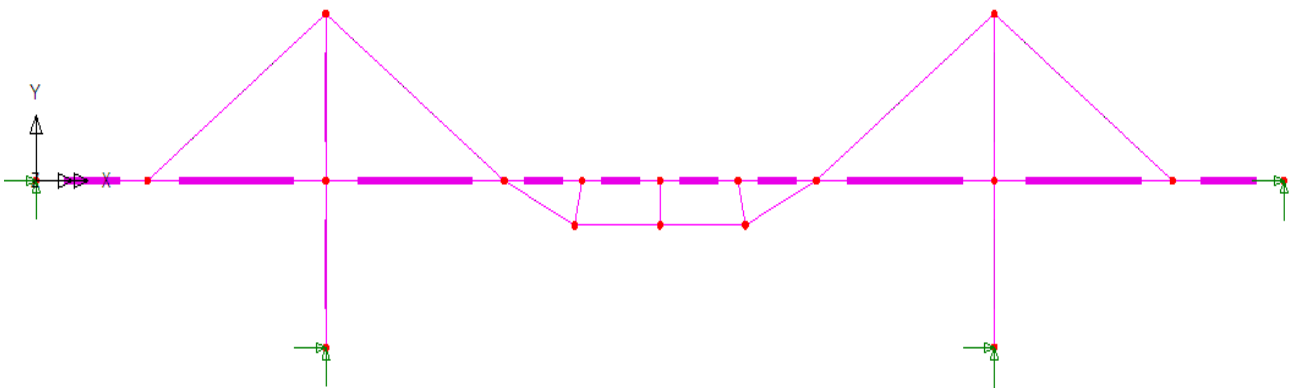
Multiple Spans Extradosed-Intradosed Bridge
